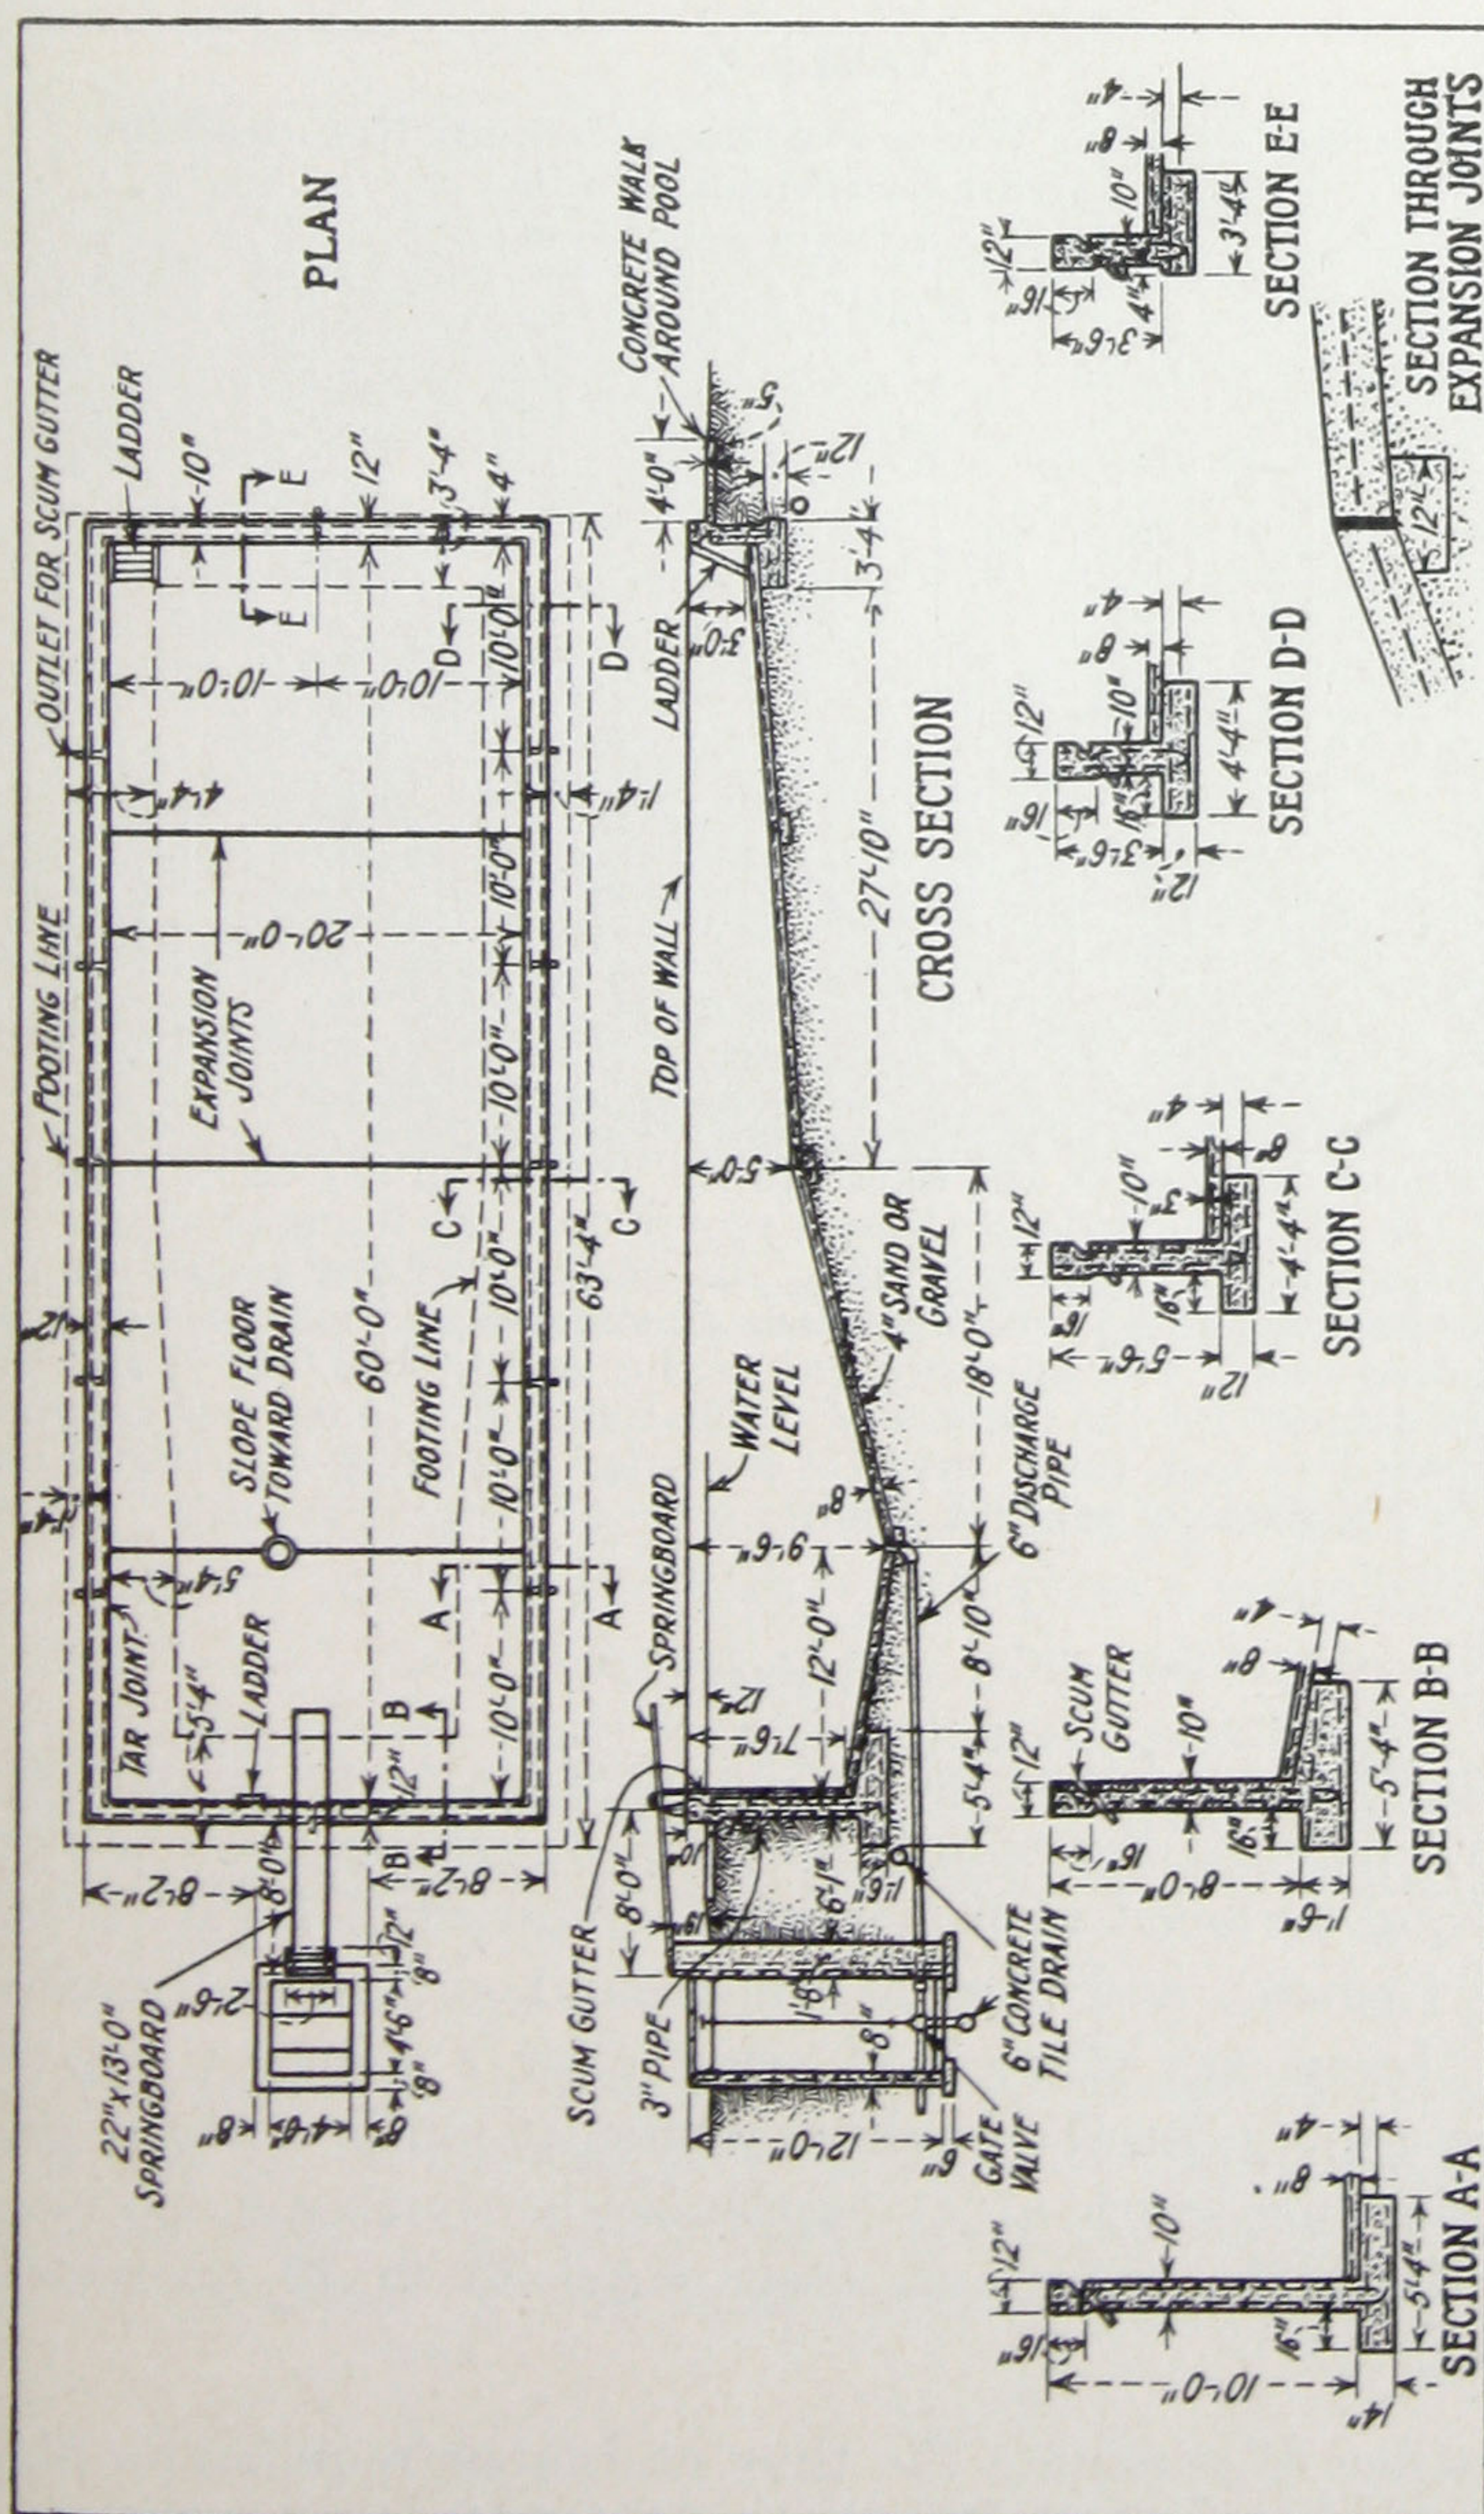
Construction details for typical 20' x 60' swimming pool.
